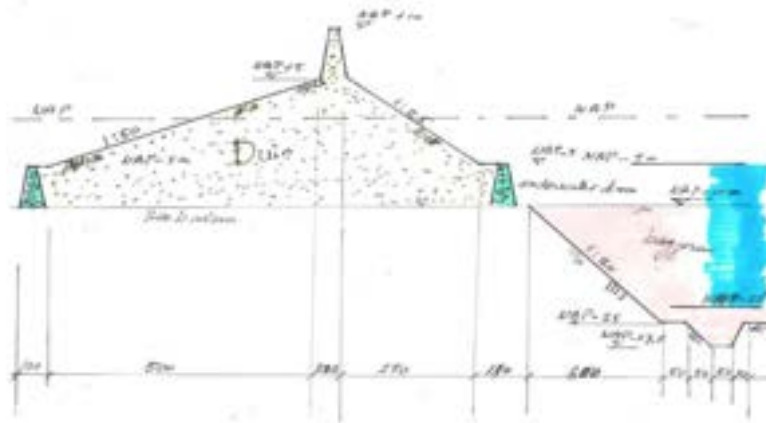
Cross section Valmeer protection dunes and storage basin. (Lavooij, 2018)
